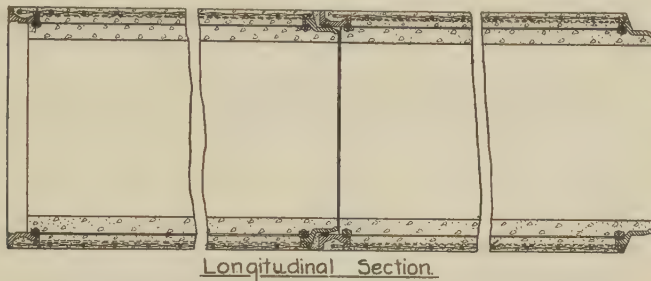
DETAILS OF REINFORCED-CONCRETE PIPE FOR HIGH HEAD.
